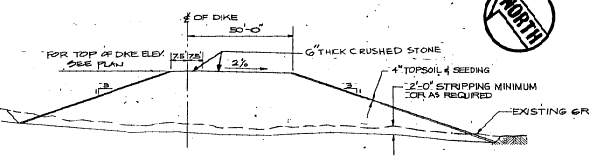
ROAD CROSSING NO. 3 (S-69)
